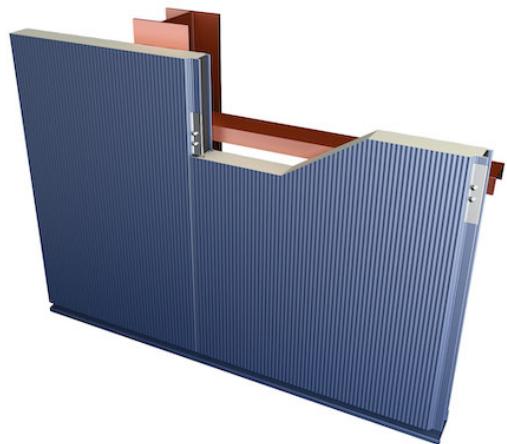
Impression of a traditional sandwich panel and a Falk CracleCore sandwich panel
